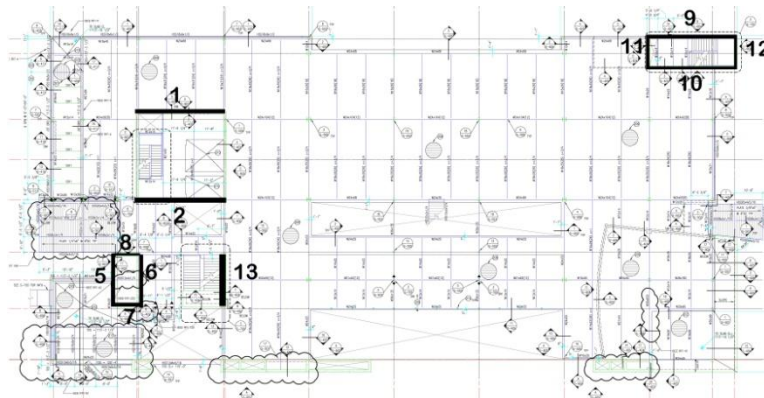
Modified Special Reinforced Shear Wall Layout. Modified by N. Trujillo. (Courtesy of Jon Anderson Architect)
